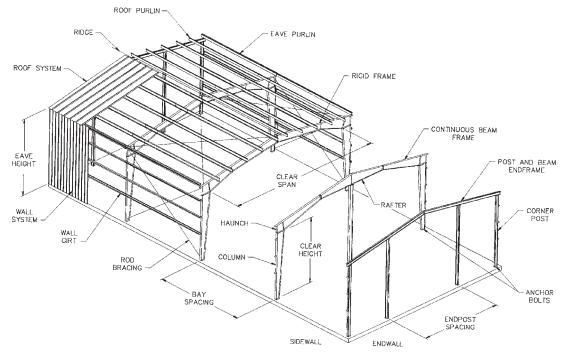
Typical components of a metal building system. (VP Buildings.)
